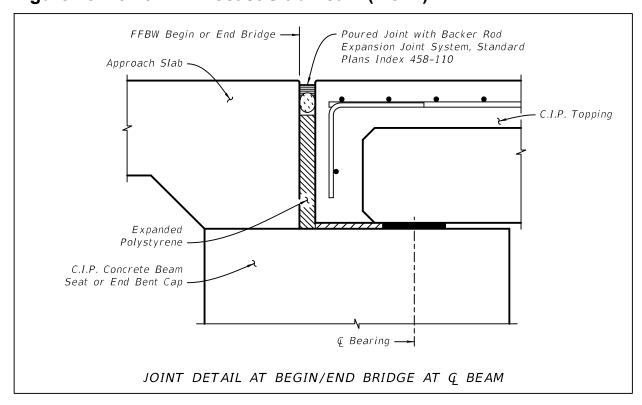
Precast Slab Beam (2 of 2)
